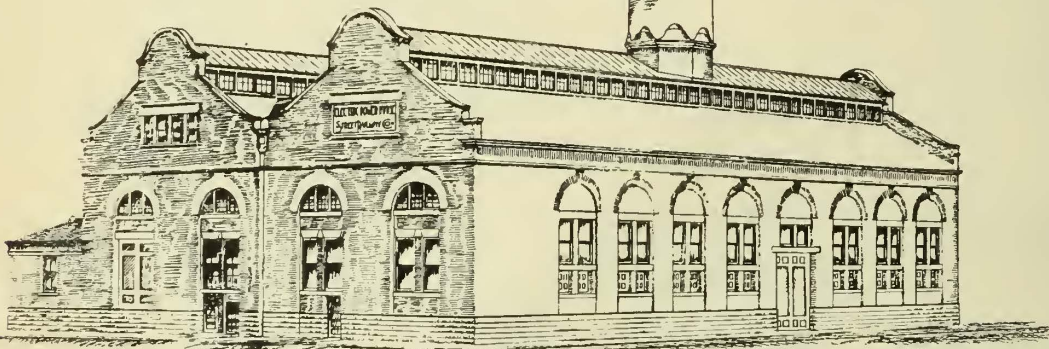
EXTERIOR OF POWER STATION—WOODLAND AVENUE & WEST SIDE RAILWAY.
